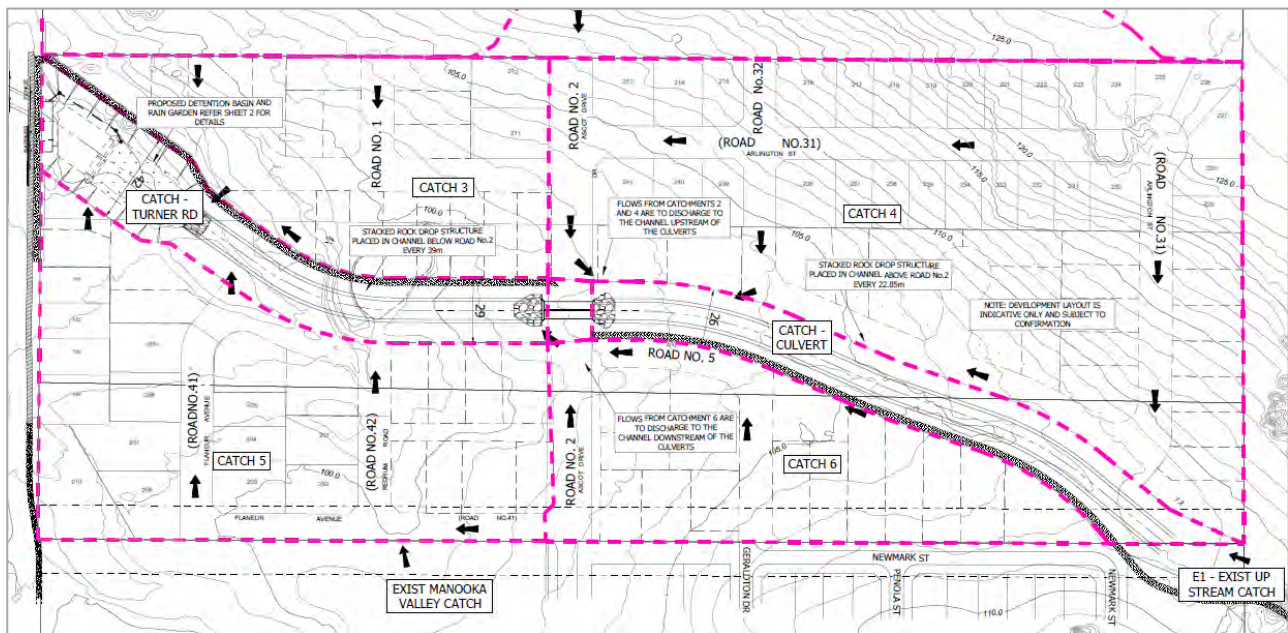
Concept Layout Plan (Source: JMD Development Consultants)
